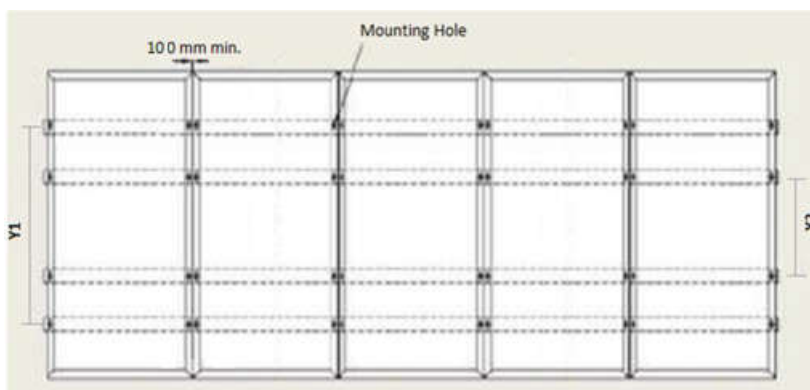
Mounting of modules using 8 mounting holes. Values of Y1 and Y2 are as per the Y-pitch mentioned in the module datasheet.
